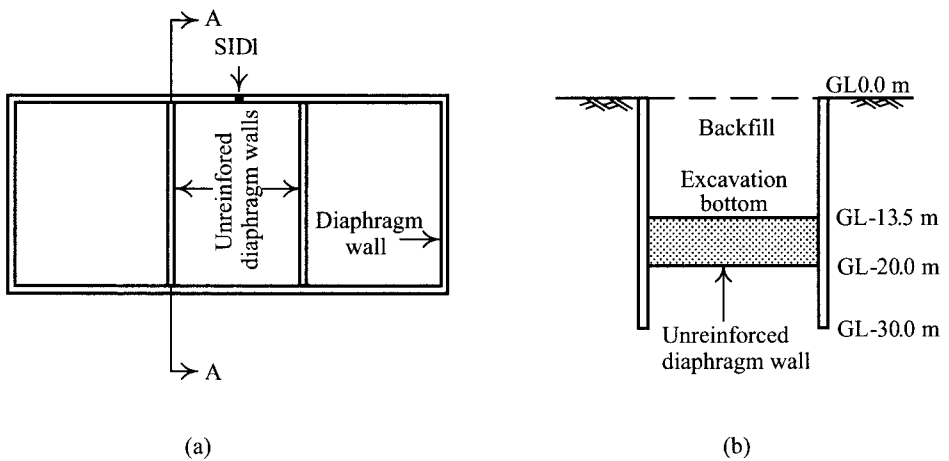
Cross walls in excavations: (a) plan and (b) profile.
